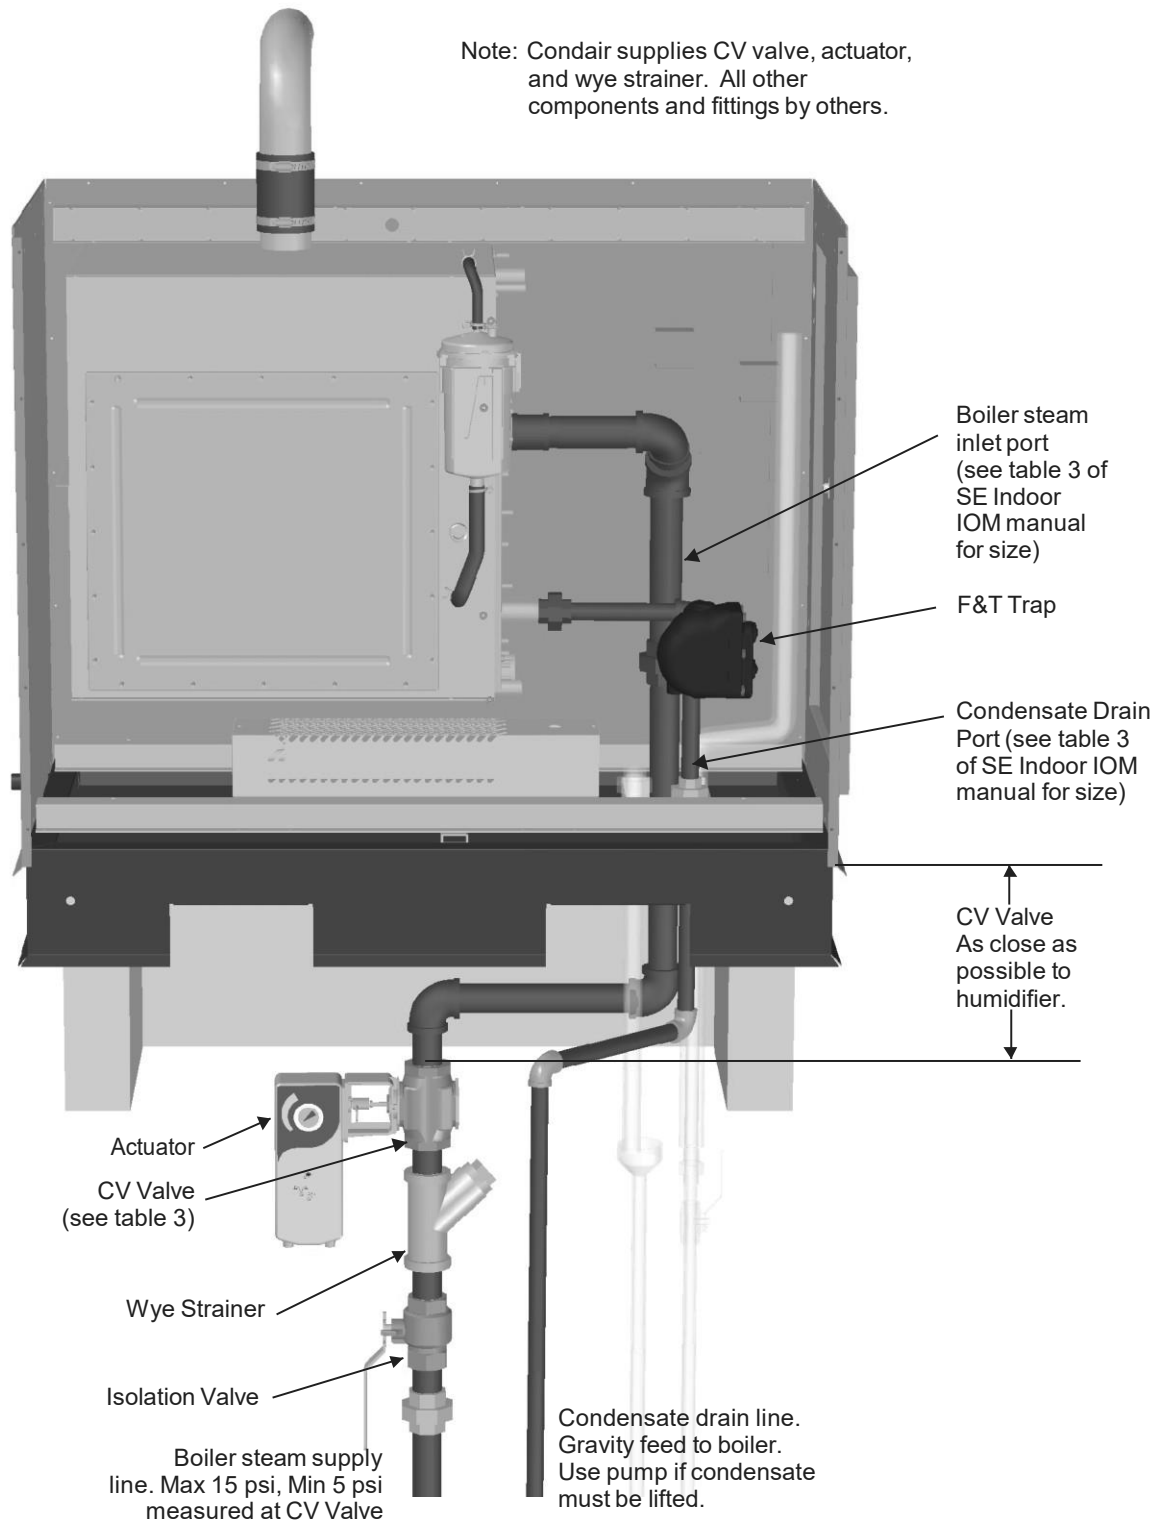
Nortec SETC Outdoor Boiler Steam and Condensate Connection
